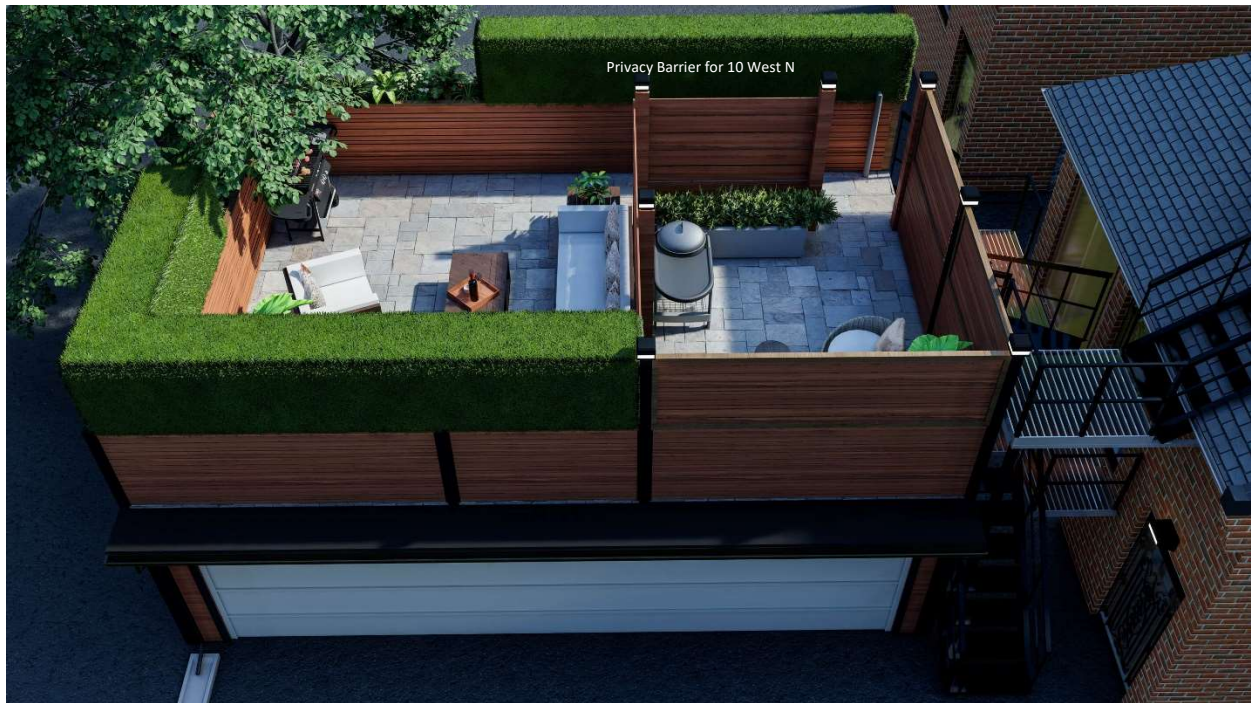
Elevated view of the deck noting privacy barrier for neighbors at 10 West N and alley.
